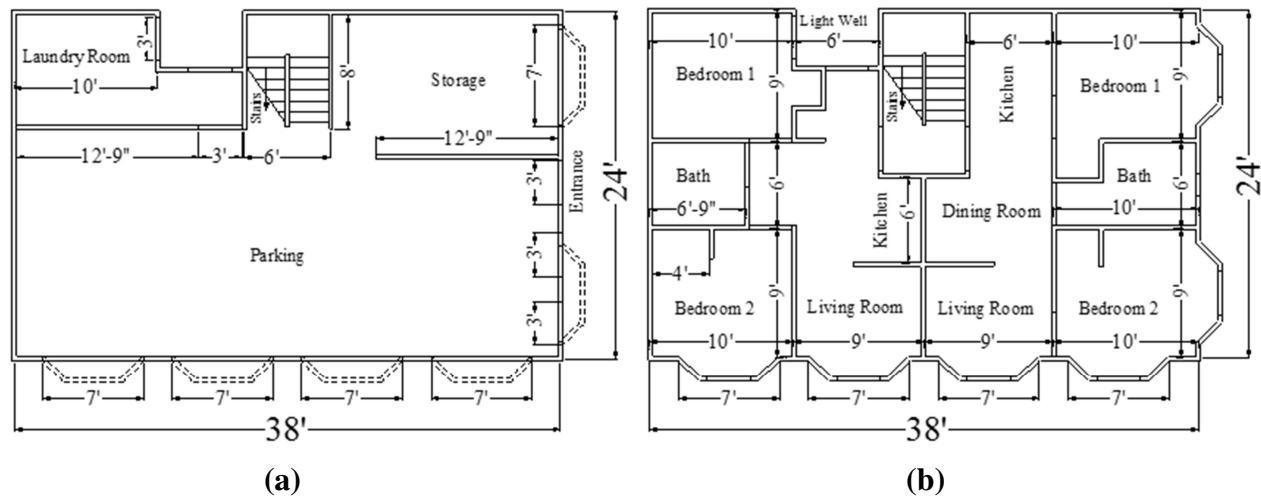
Floor Plans for the four-story building. (a) Ground story, (b) Upper stories
